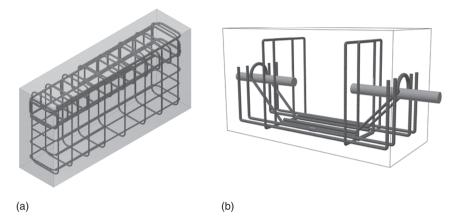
Reinforcement cages: (a) typical rectangular pattern of longitudinal bars and side aligned stirrups, (b) freely bend reinforcement derived from strut-and-tie modeling [5].
